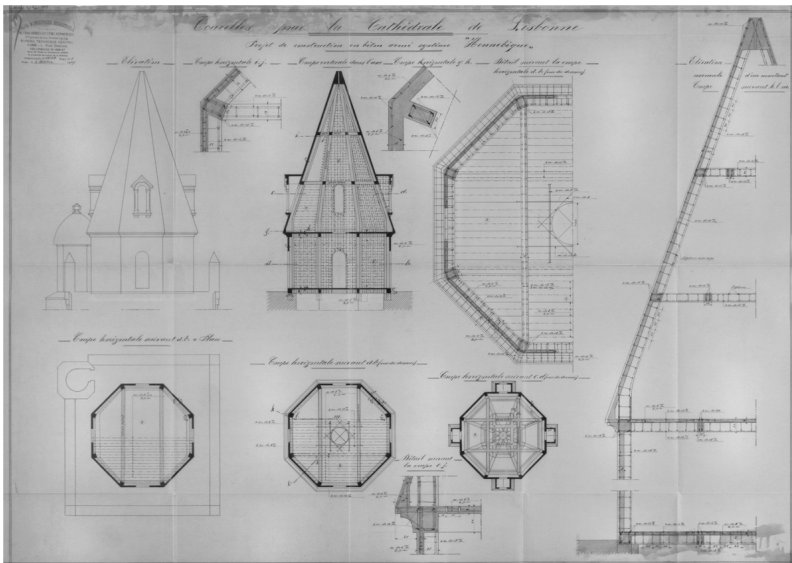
Lisbon cathedral tower, construction plan drawn in Paris, 1907 (IFA/CAA).
